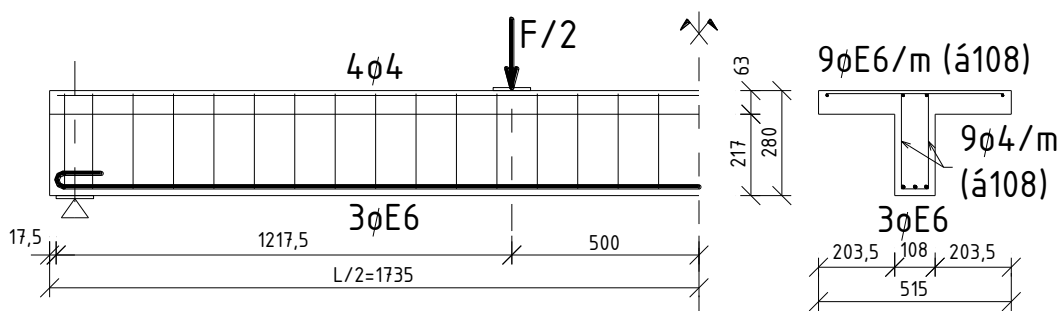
The three times reduced RC girder of RC bridge girder in the village Kolárovice on the road I/18
